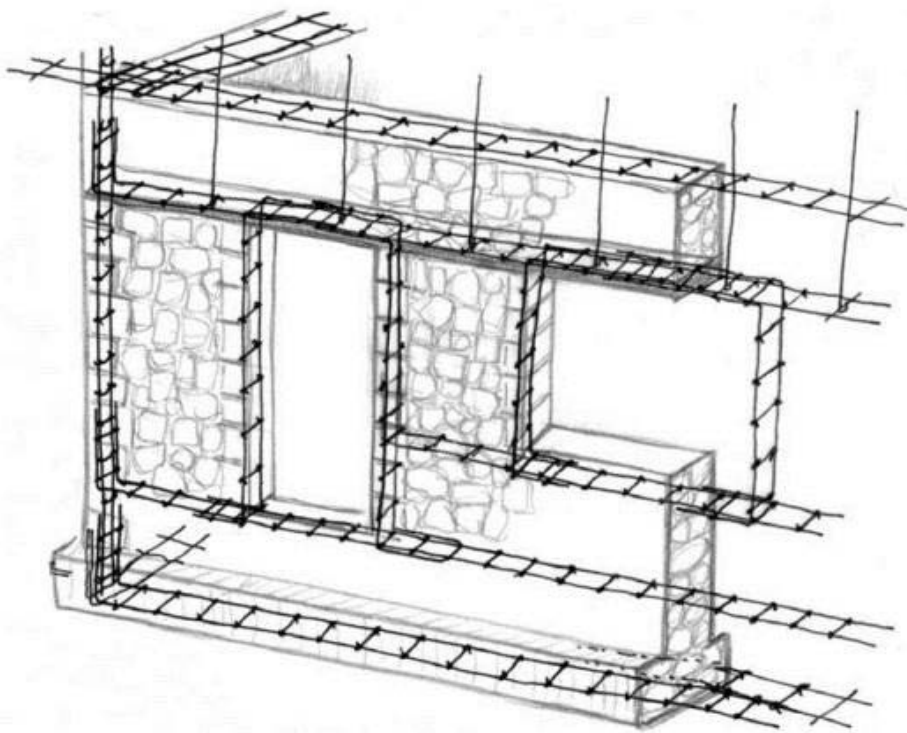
Internally applied galvanized steel wire (Nienhuys 1999)
